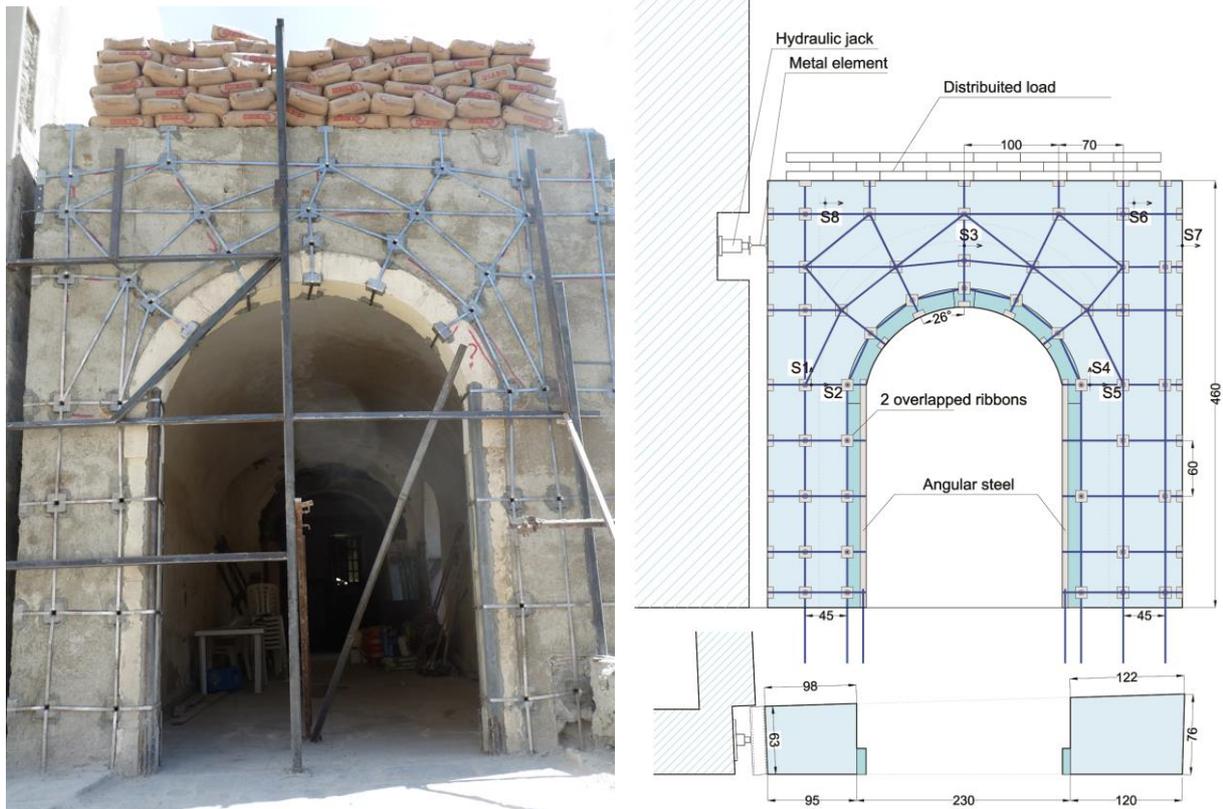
Reinforced arch: a) preparation and b) setup (dimensions in cm).
